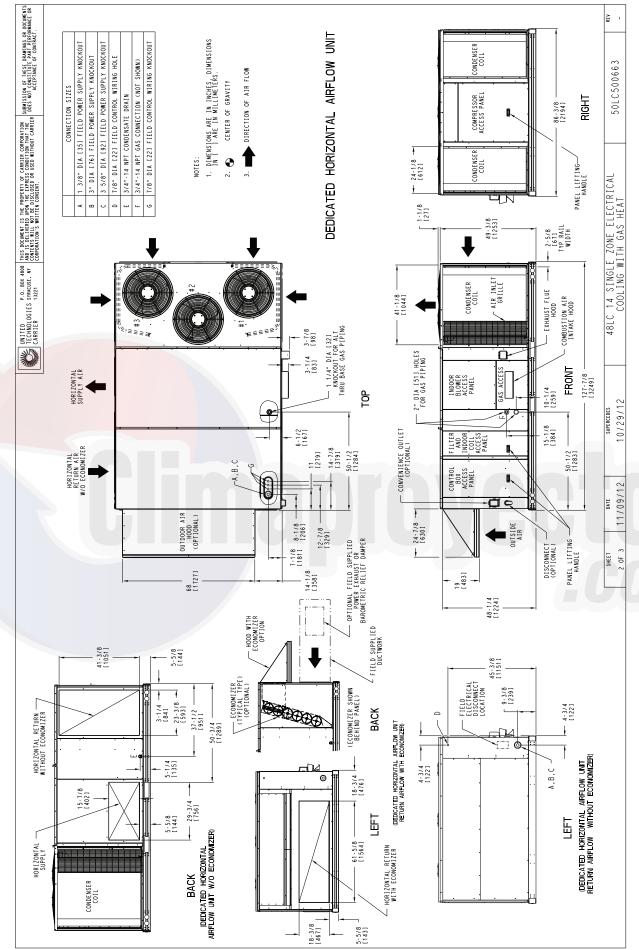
(cont.) - Unit Dimensional Drawing - 14 Size Unit, Sheet 2 of 3
